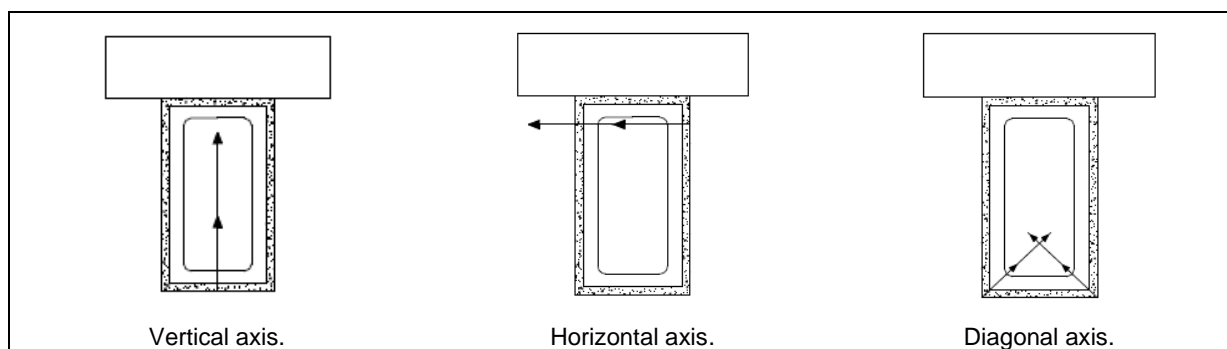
Direction inside the concrete depth of a beam¹⁴.
